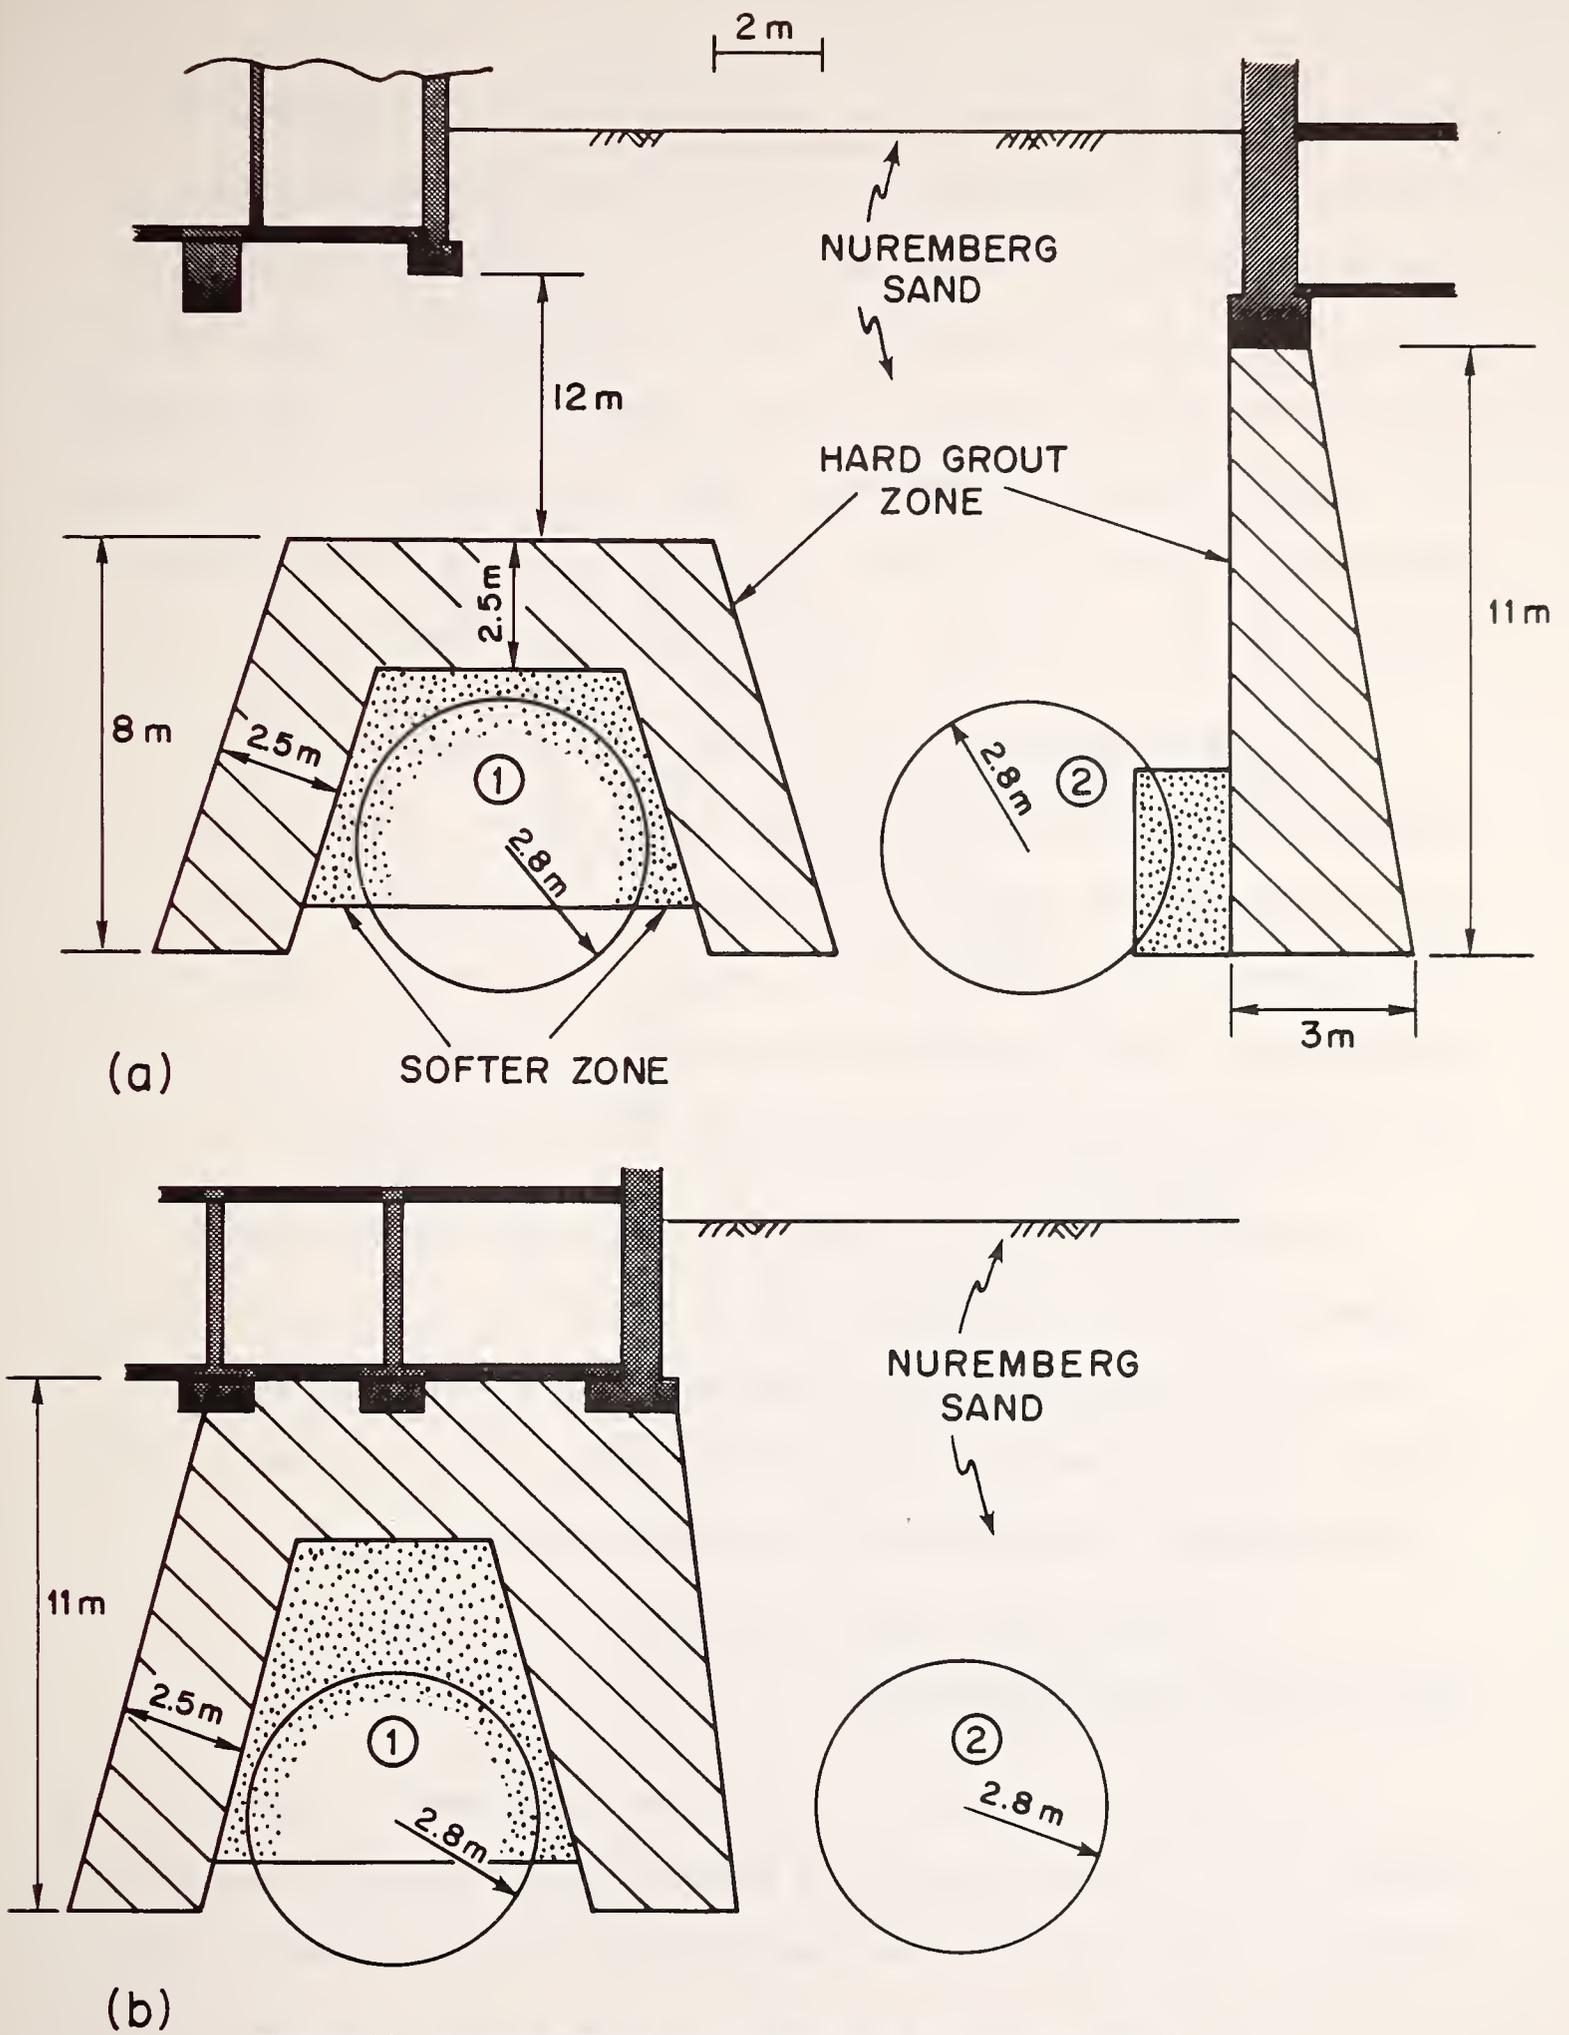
DESIGN GROUTING ZONES FOR NUREMBERG SUBWAY
